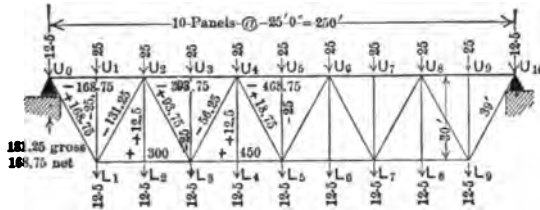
Dead Panel Loads and Index Stresses. Single-Track Deck Subdivided Warren Truss Railroad Bridge.
